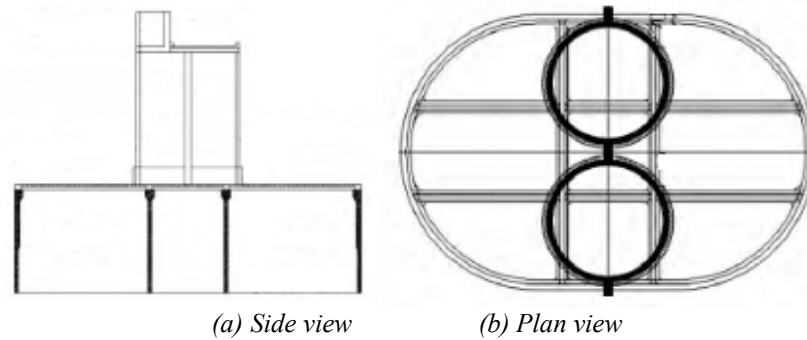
Cross-section view of a new barrel base structure breakwater[14]
